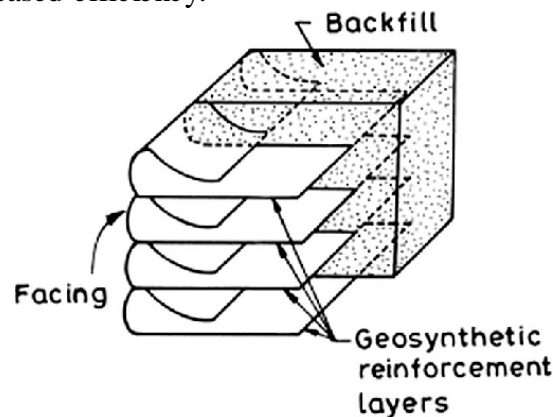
Diagram of a GRS retaining wall (Cheng et al., 2006)
